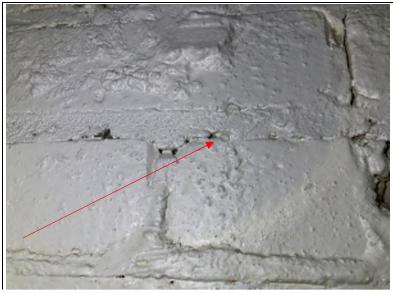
Visible evidence of water dripping through the wall to the interior.
